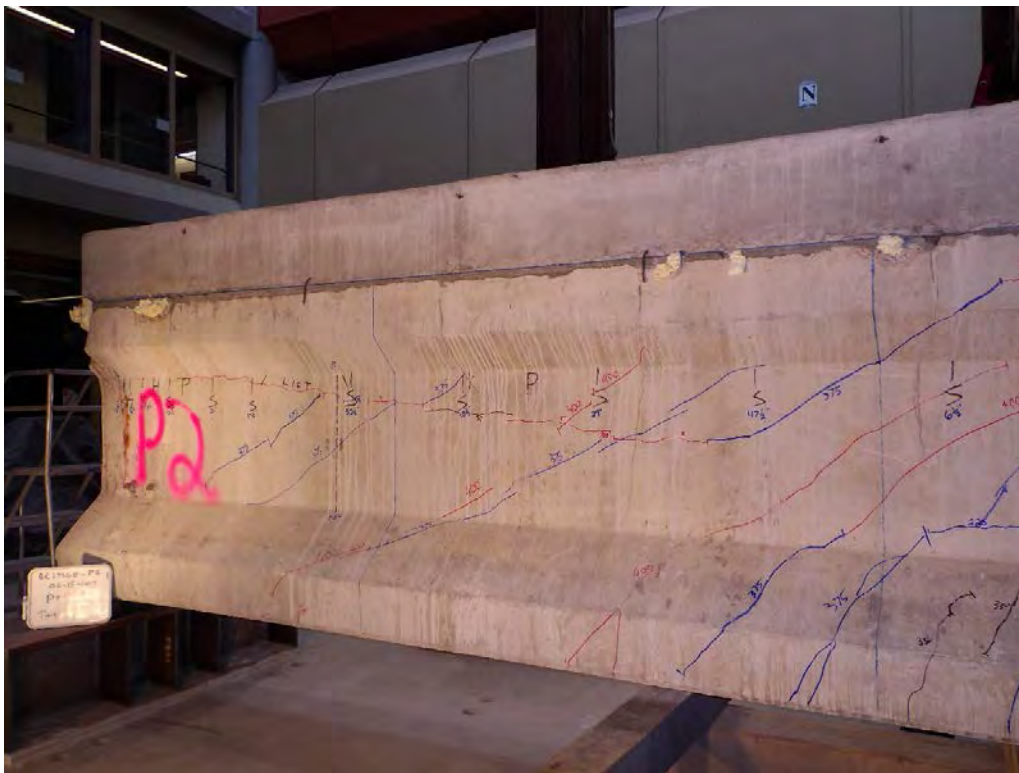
Girder P2 Southside Section 1-Section 2 $P=400$ kips
